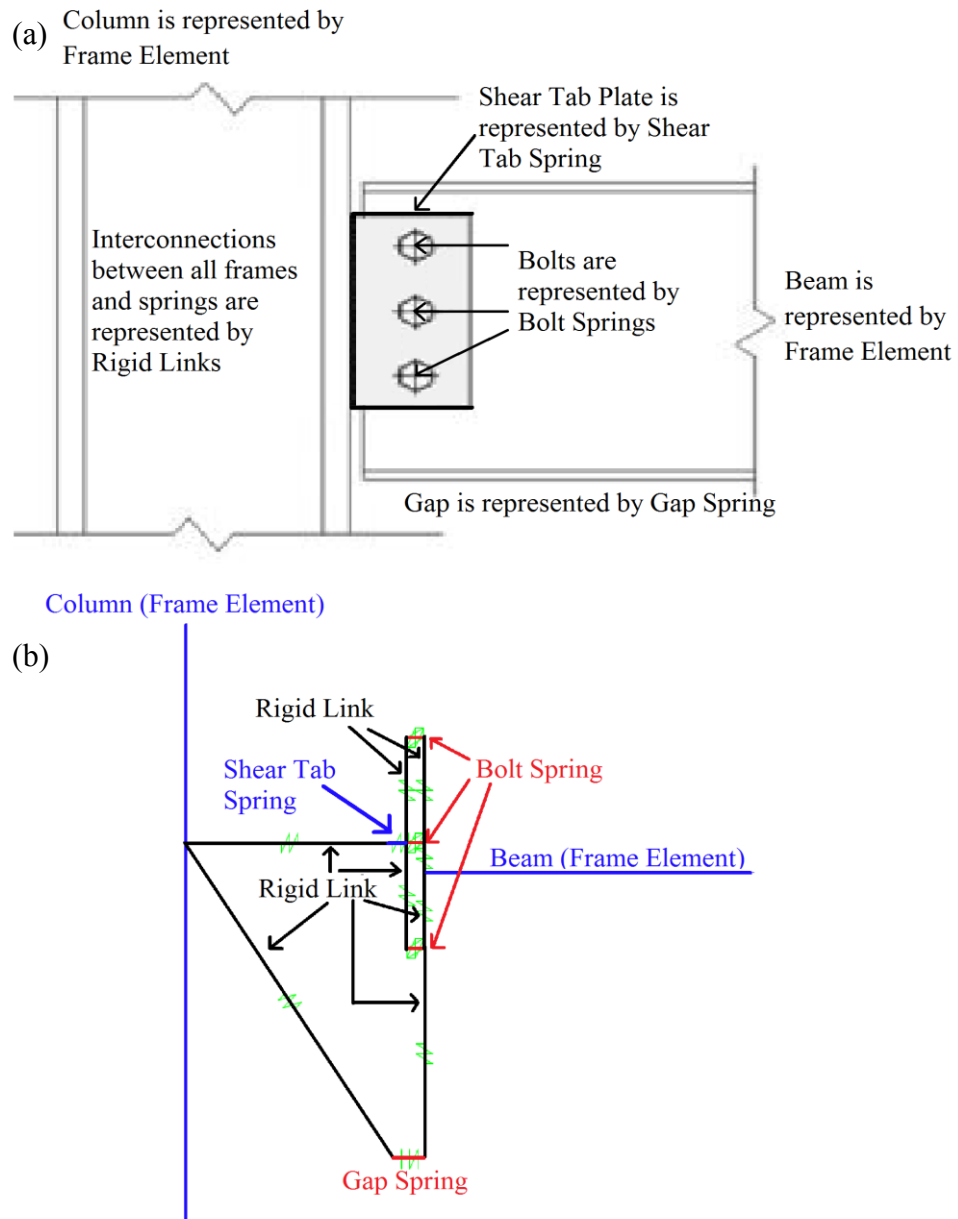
Beam-to-Column Single-Plate Shear Connection: (a) drawing of the connection; (b) simplified model of the connection
